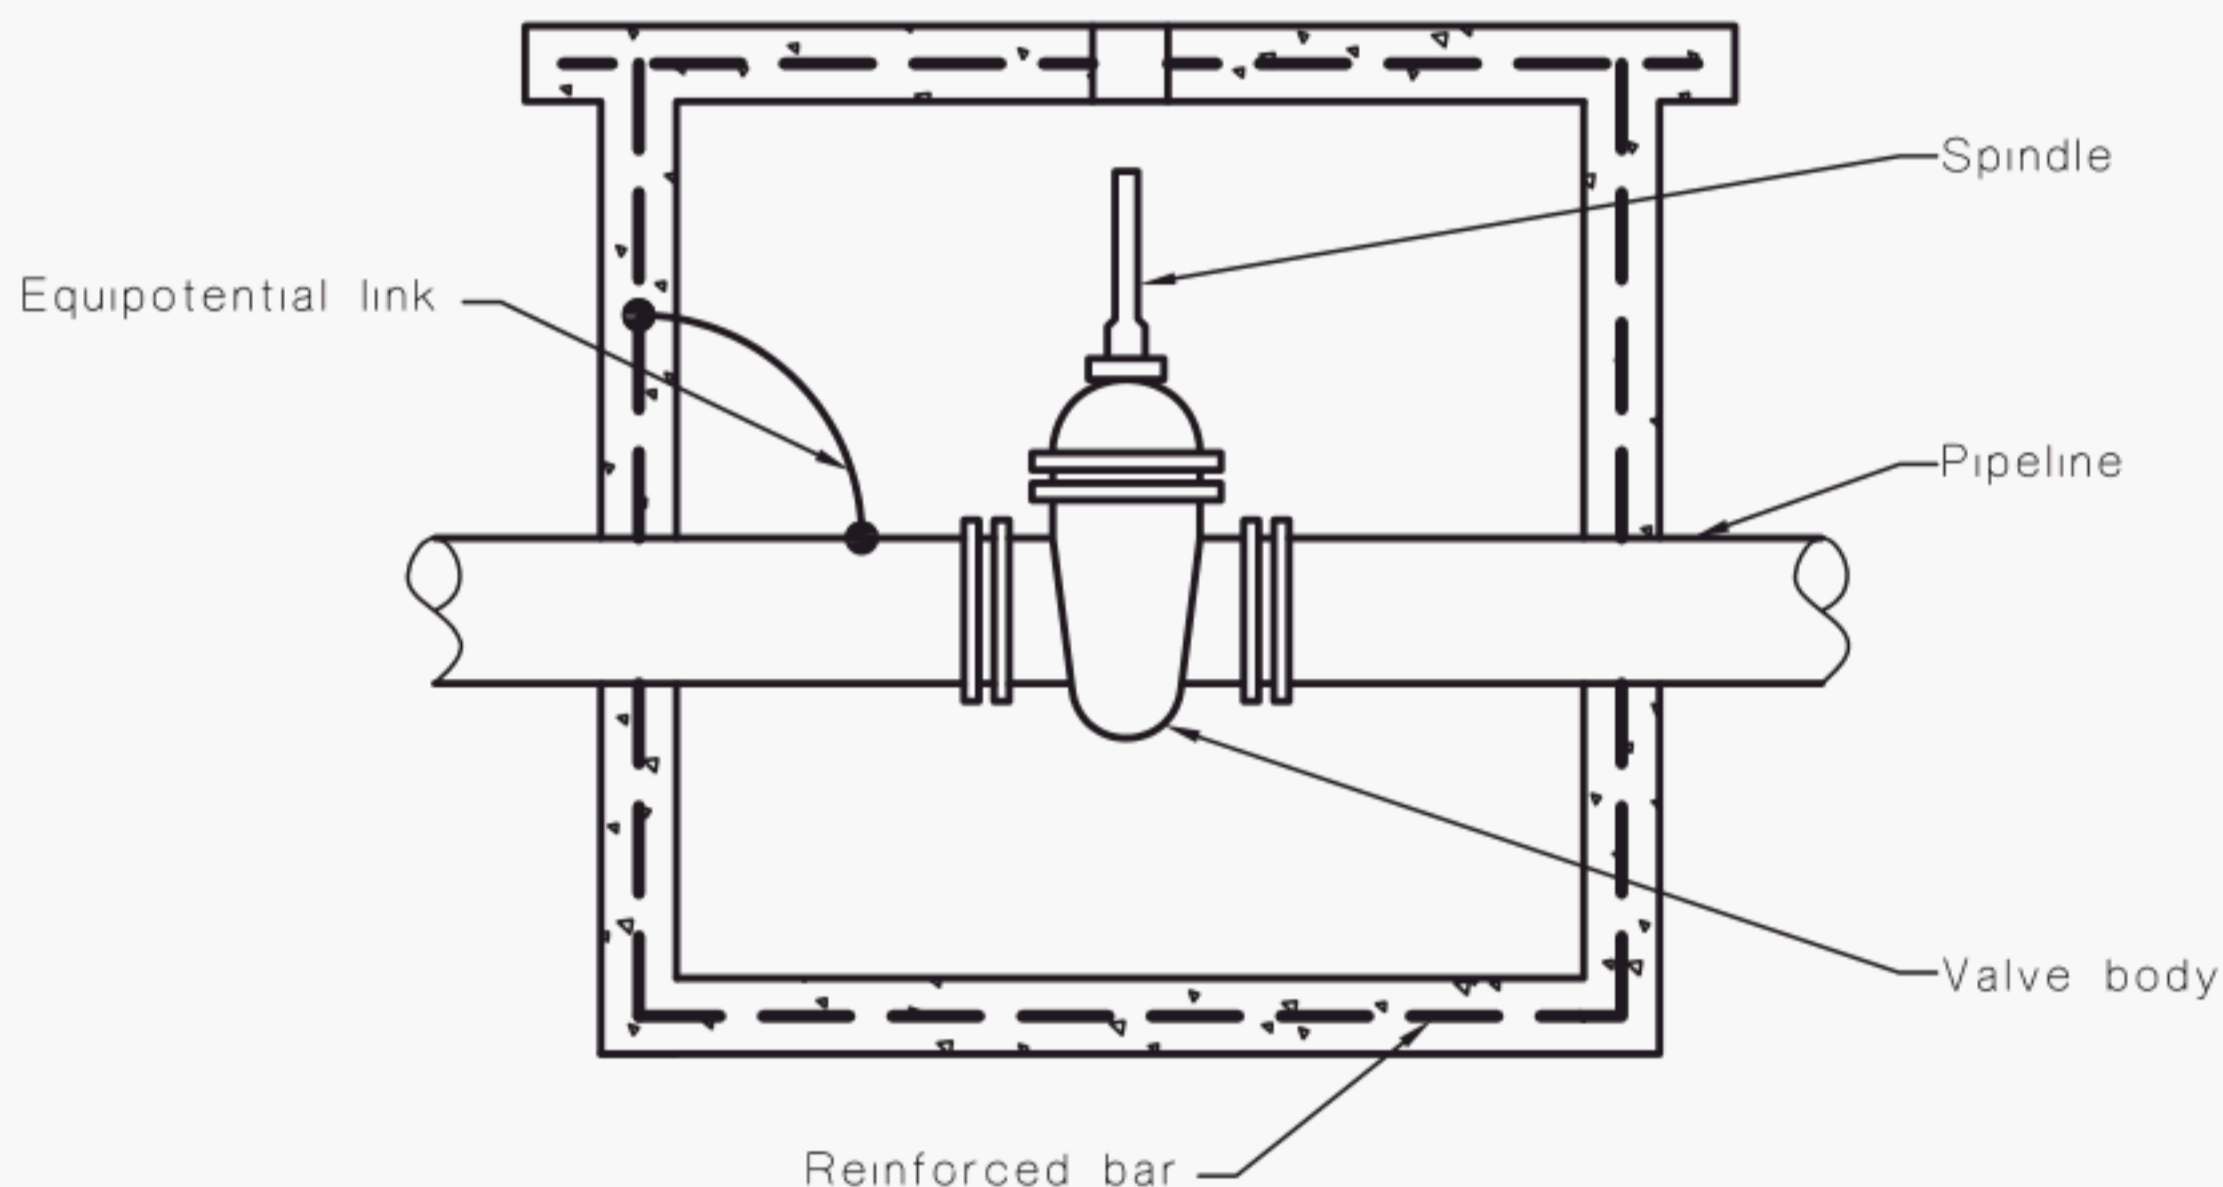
FARADAY CAGE CONCEPT FOR EPR AT VALVE
